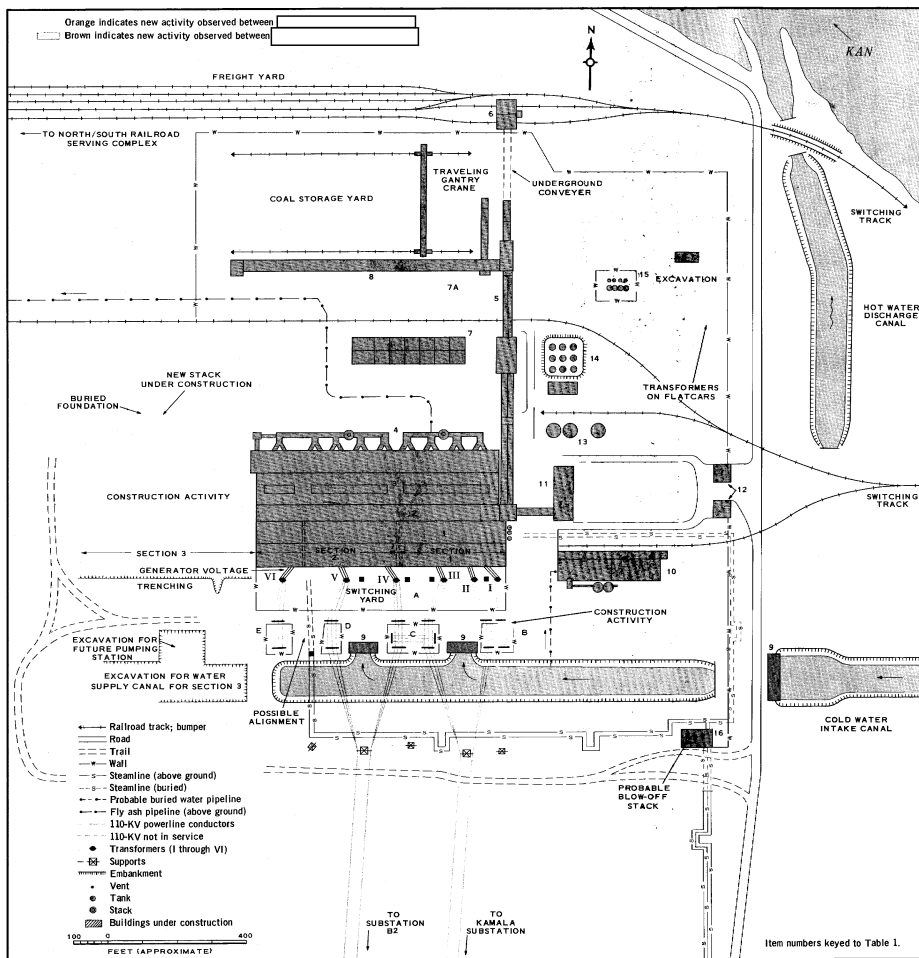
LAYOUT OF THERMAL POWERPLANT.
